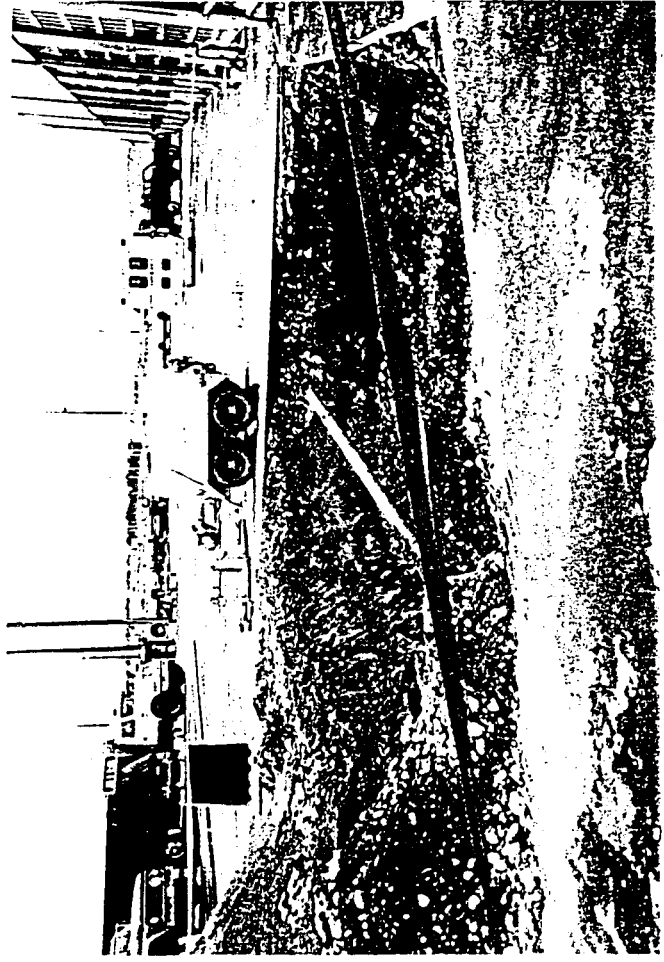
Final Tank Excavation - View Southeast (October 31, 1994)
